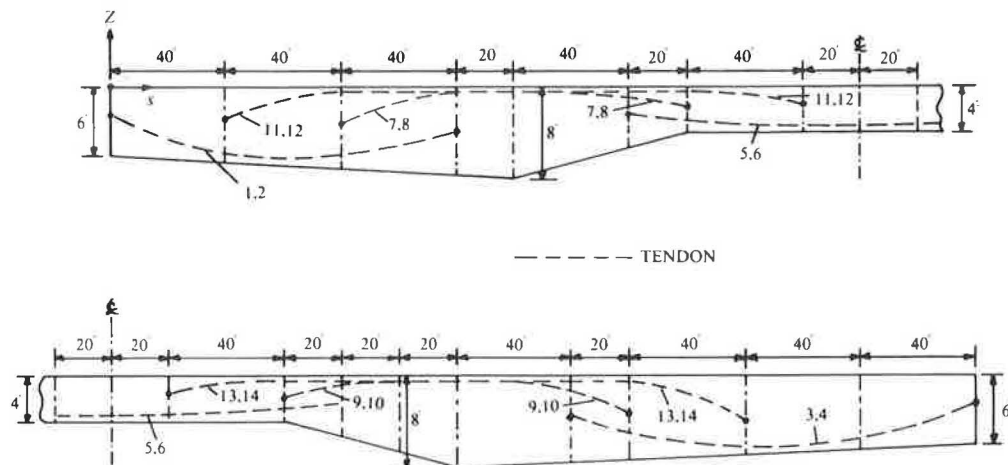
Example 1: three-span curved nonprismatic prestressed concrete bridge—longitudinal section along centerline.
